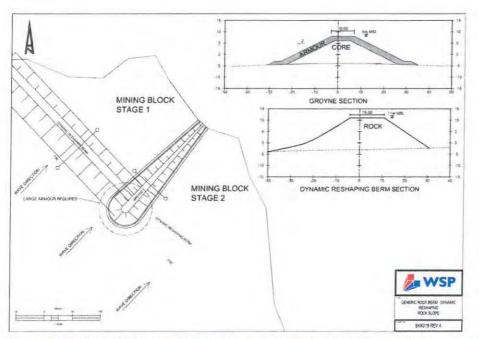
Layout of alternative berm - dynamic reshaping rock slope with shore perpendicular groyne
